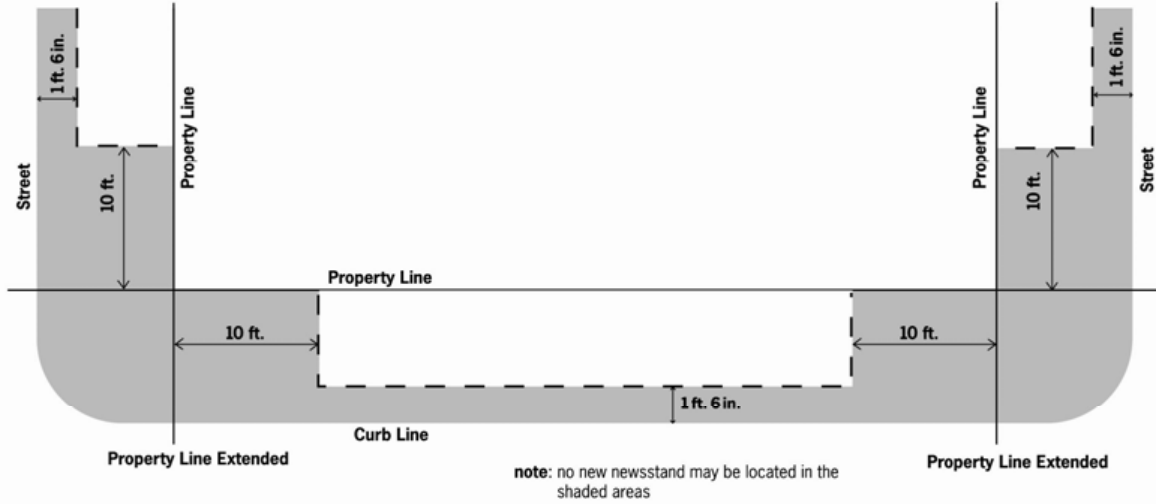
Typical full blockfront plan showing clearance from corners and curb of street
